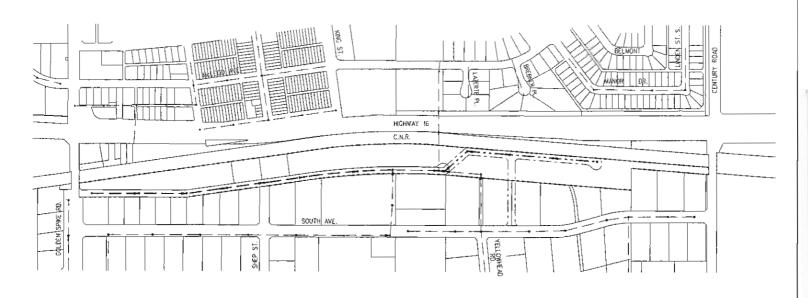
shows the alignment of an existing 375 mm sewer trunk through the middle of the site. It drains across the railway and Highway 16A. (An easement will be required at the subdivision stage.) This trunk has sufficient capacity to serve the entire site. New lines will connect to this sewer at two points to drain from the east and west.
